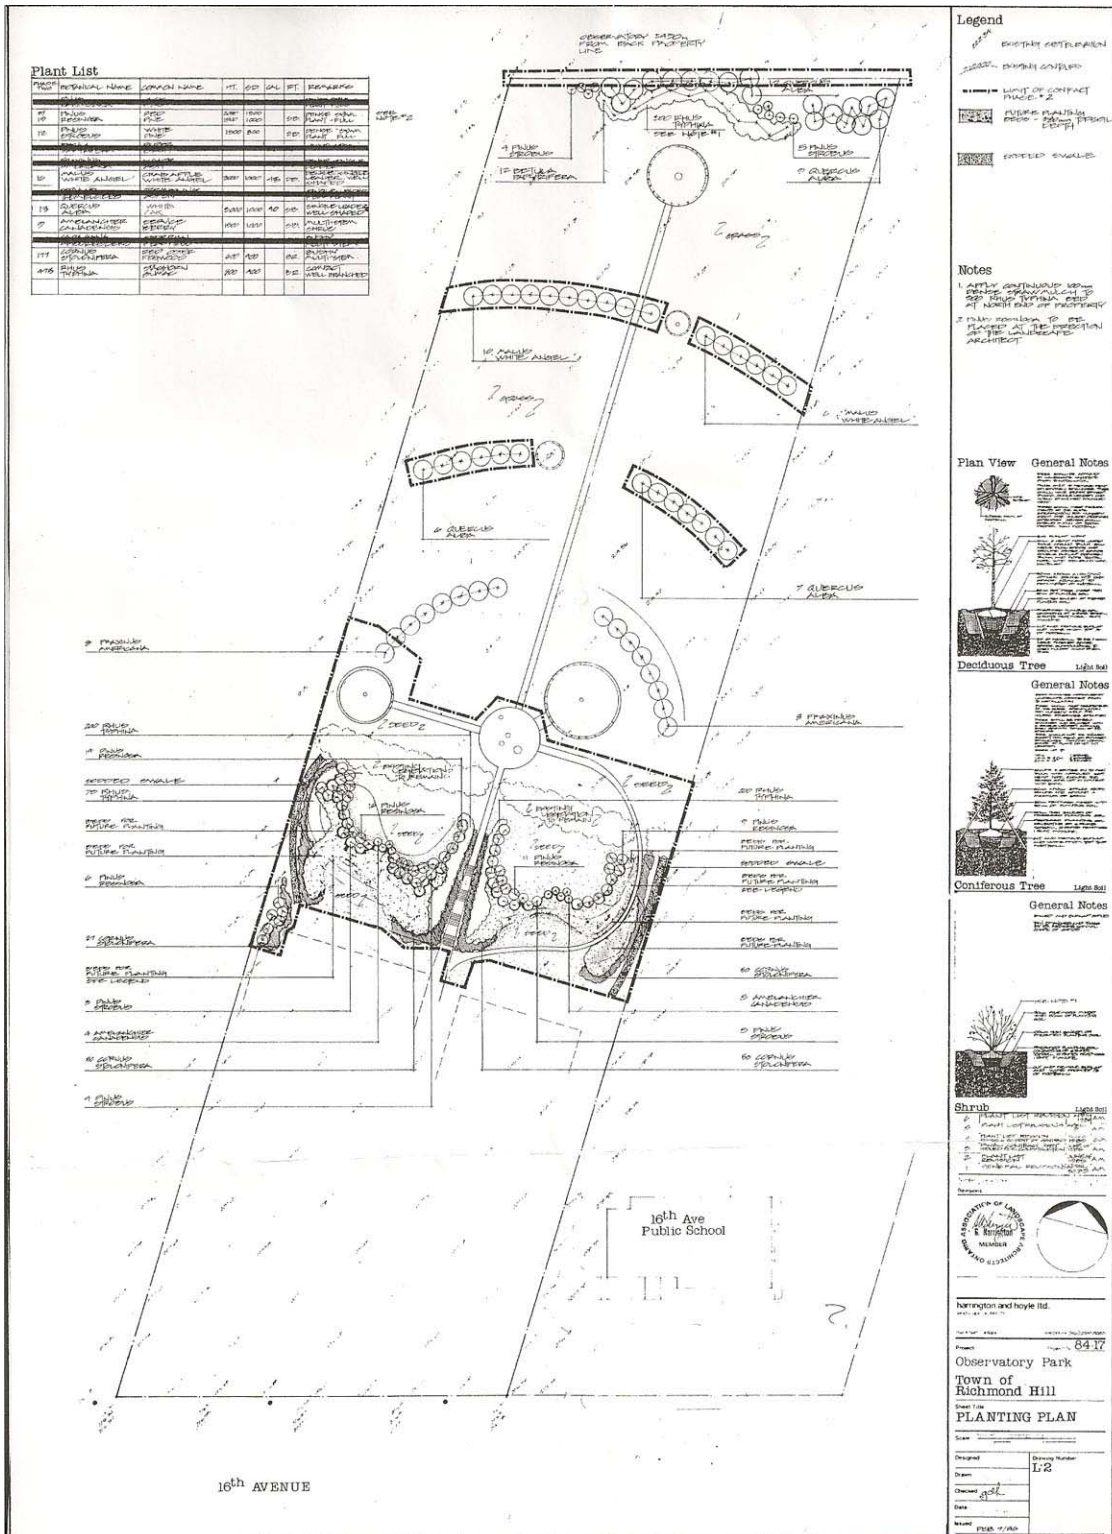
H&H Planting Plan for Observatory Park Town of Richmond Hill
